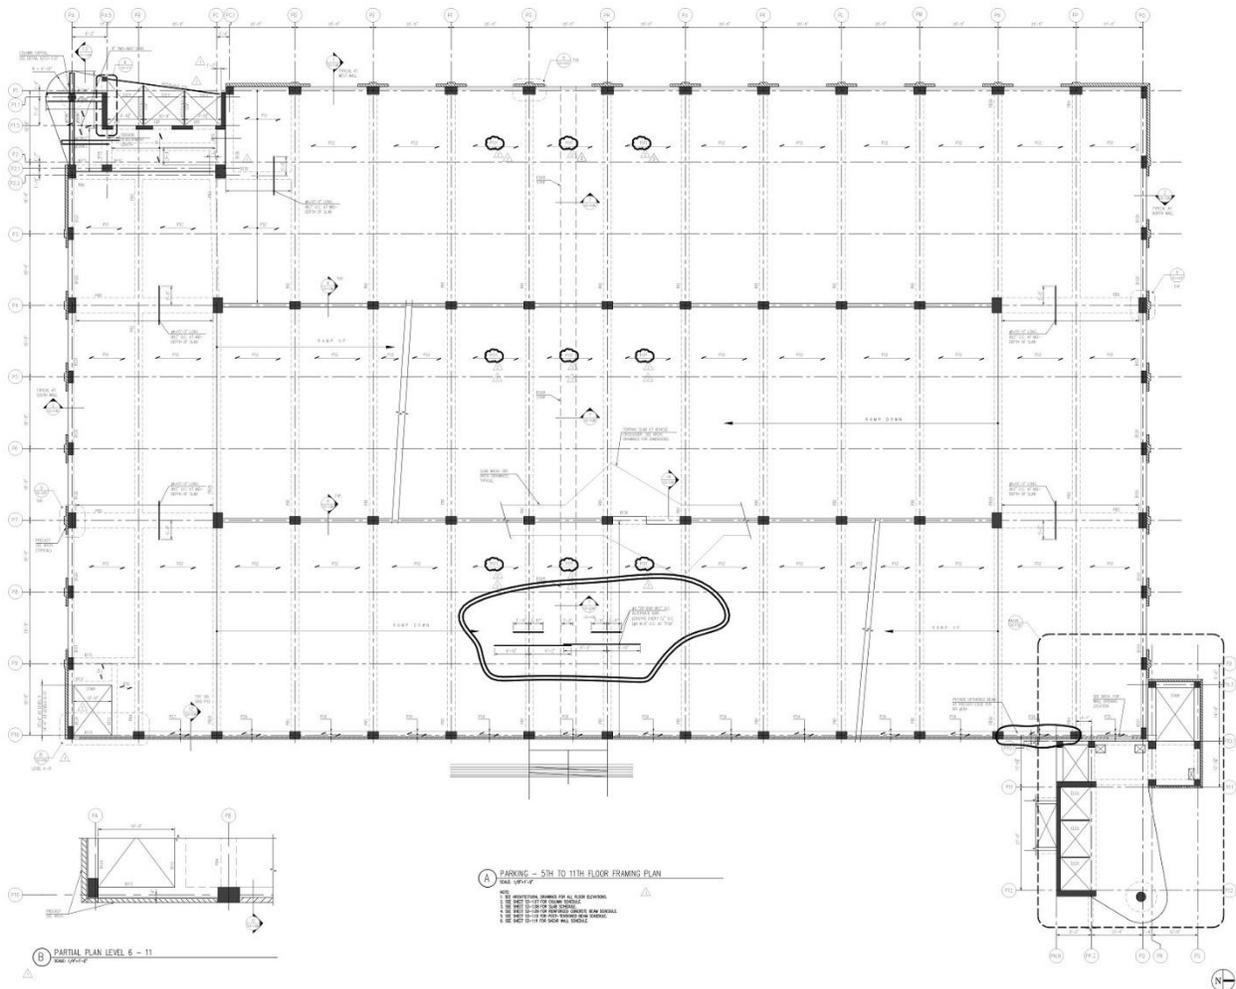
Plan view of a typical floor of the Sherman Plaza Parking Garage.
